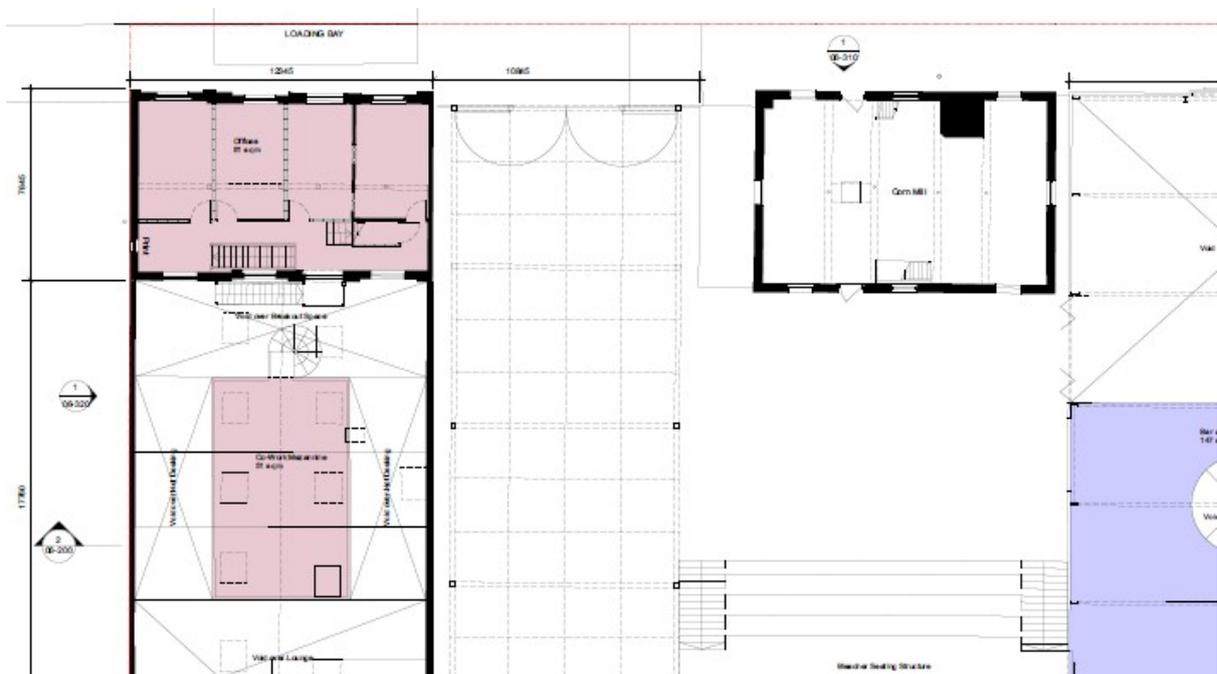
Proposed First Floor Plan (floor 3 of Old Corn Store has similar layout)
